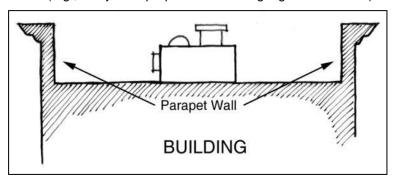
F: Example of how parapet walls are utilized to screen roof mounted mechanical equipment.
